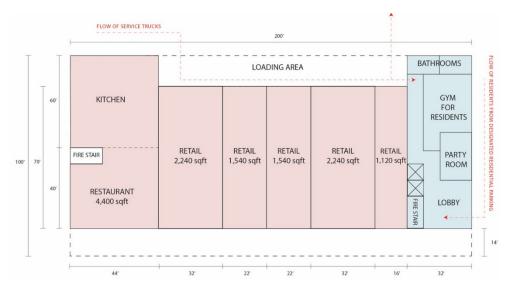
A floor plan detailing the layout of the retail units on the first floor of Elkhorn Crossing.
